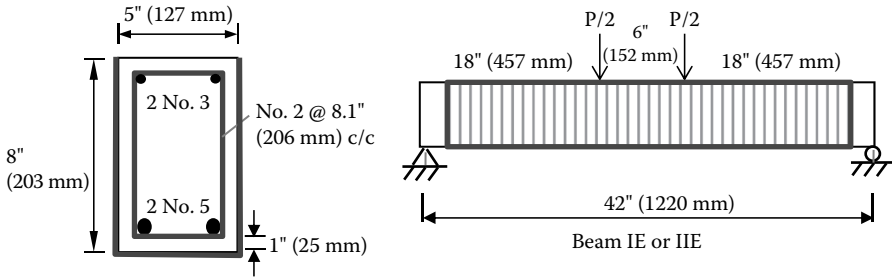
Example 6.3 showing the beam section and profile.
